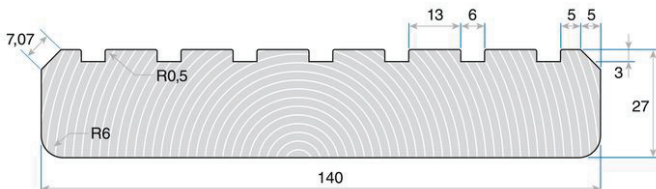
Detailed profile of heat-treated Norway spruce terrace planking boards (27x140 mm)
